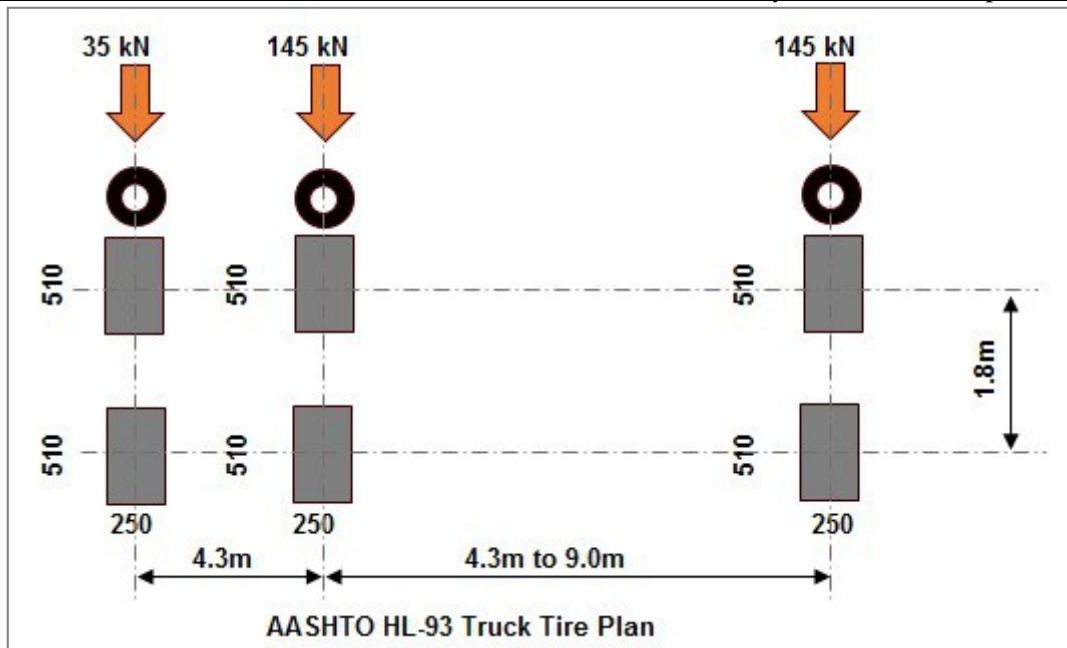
HL-93 design truck tire plan (AASHTO Bridge Design Specifications Cl 3.6.1.2).
